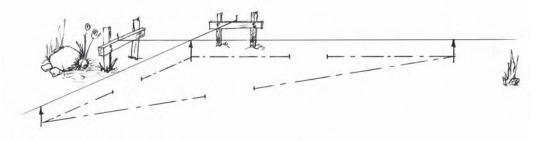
Marking the position of the wall at a right angle to the first wall
